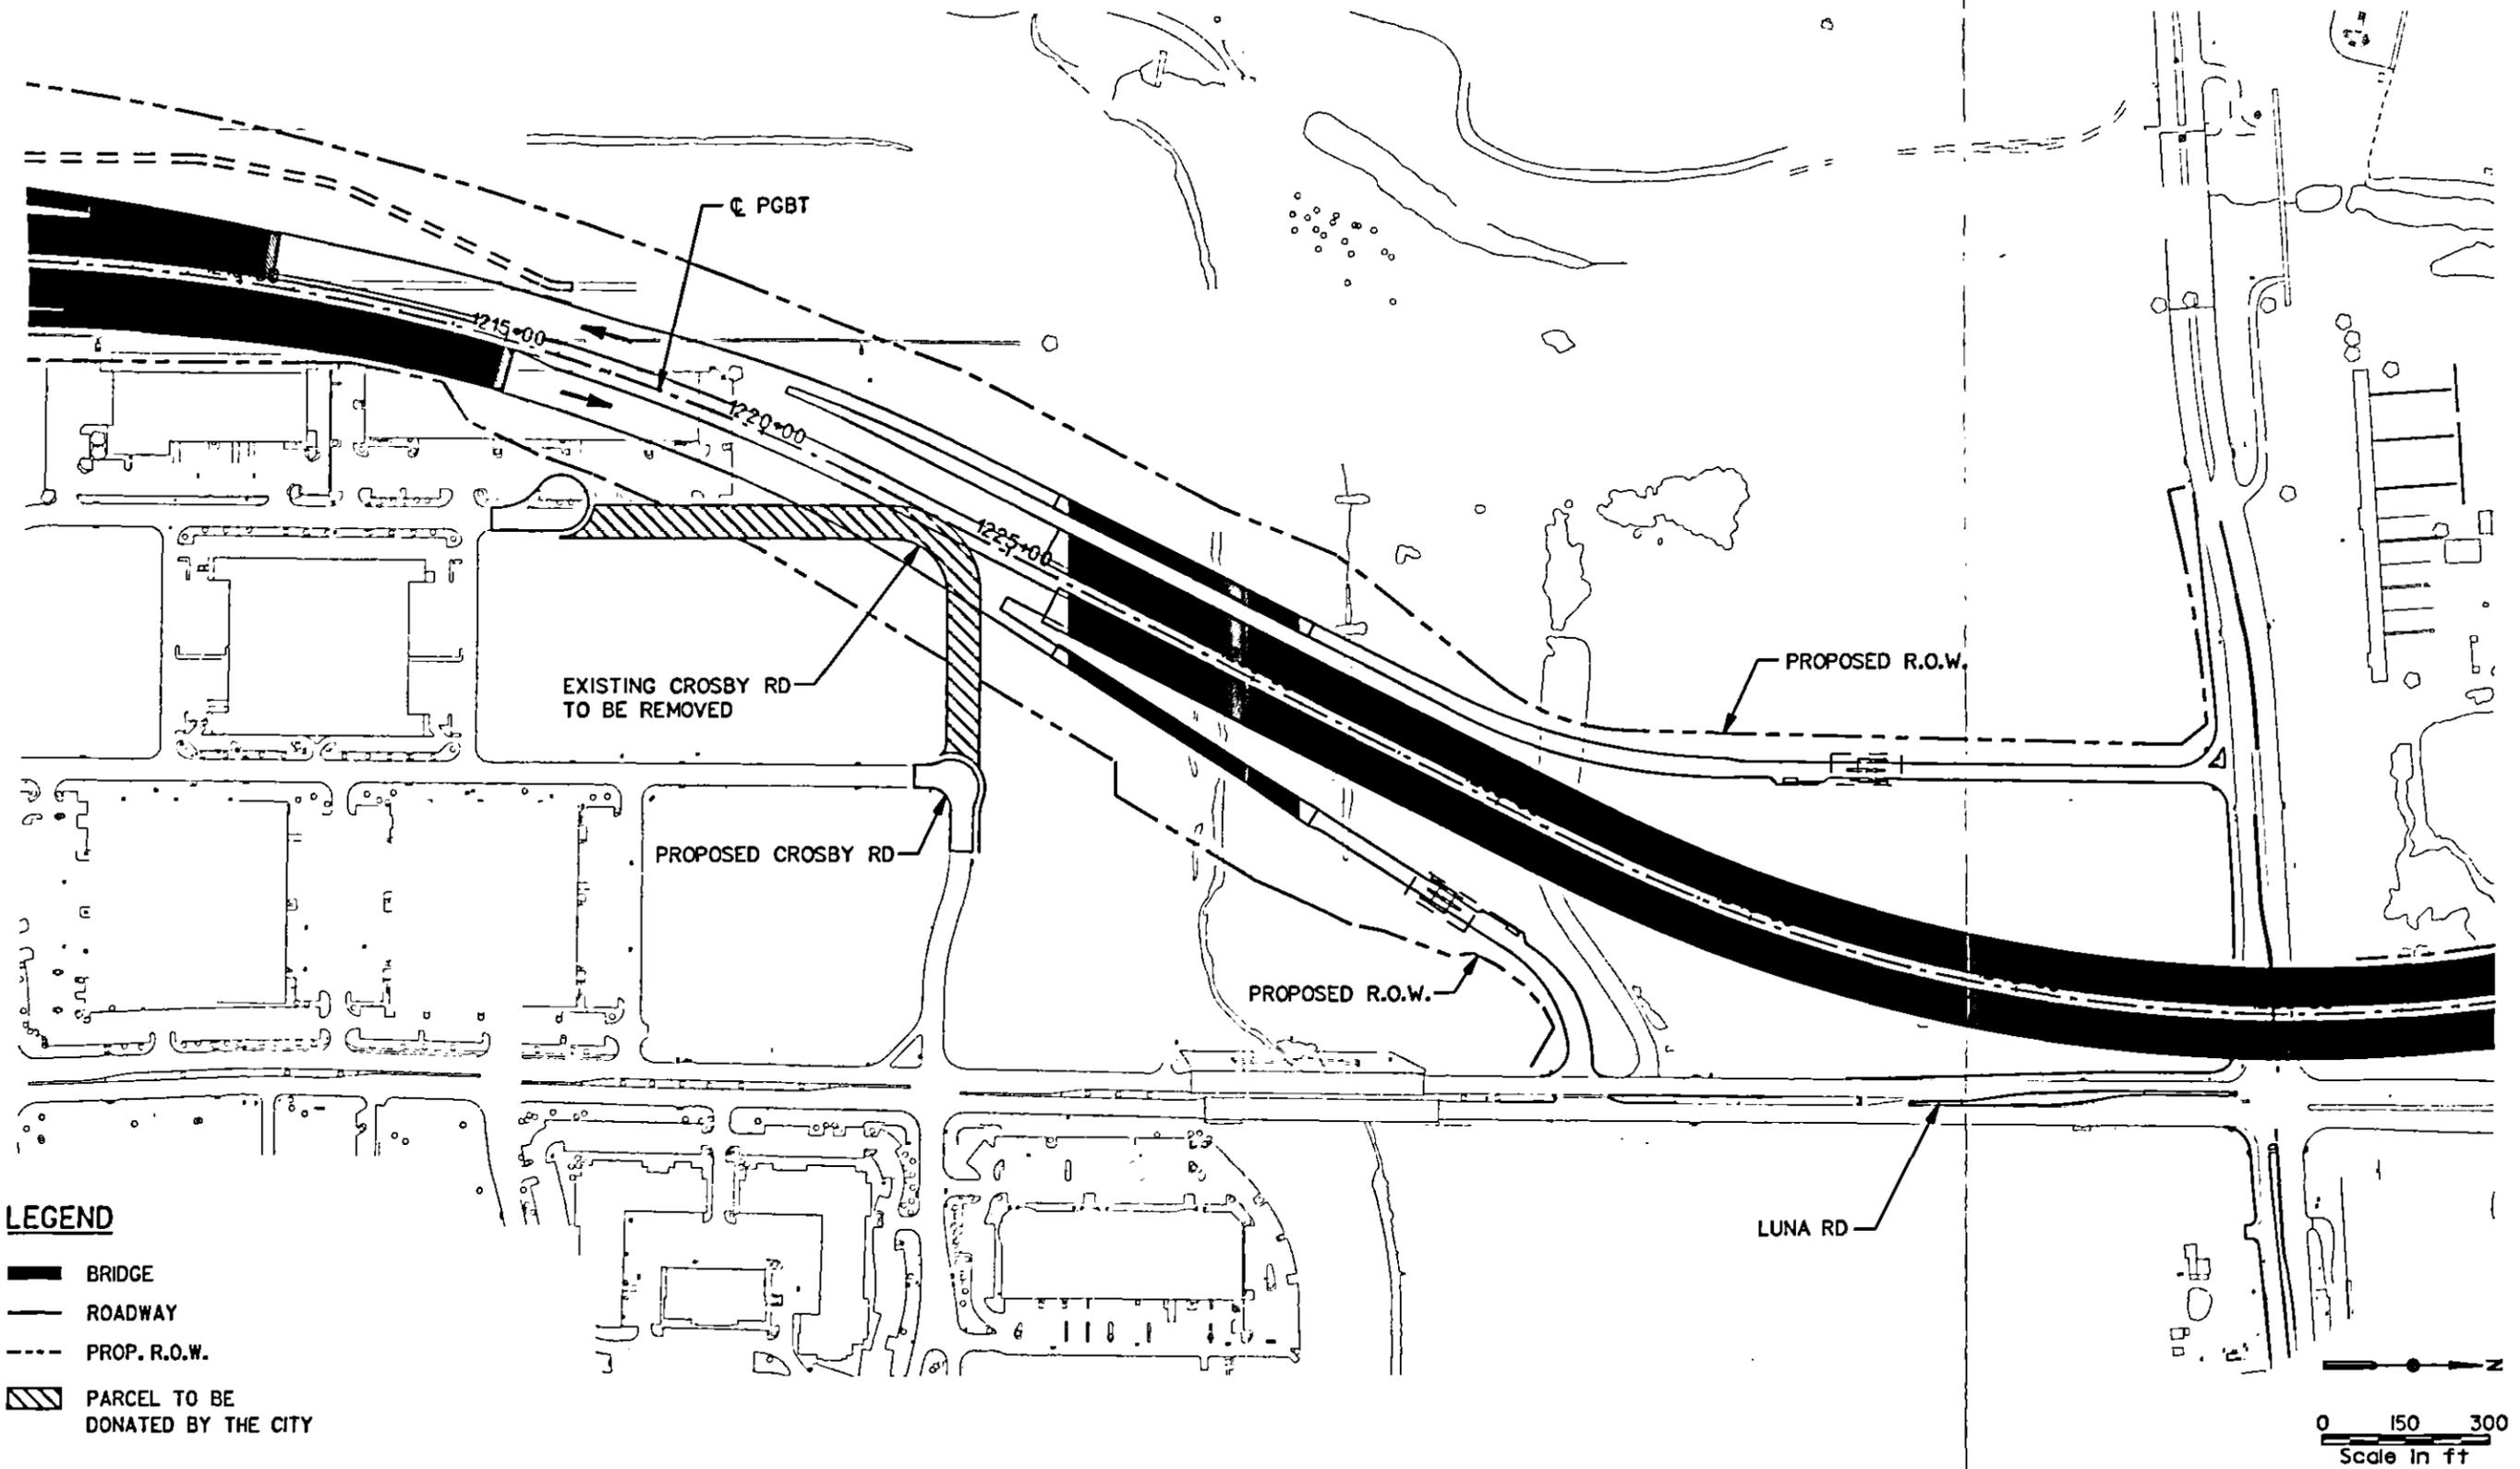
LUNA ROAD INTERSECTION LAYOUT
